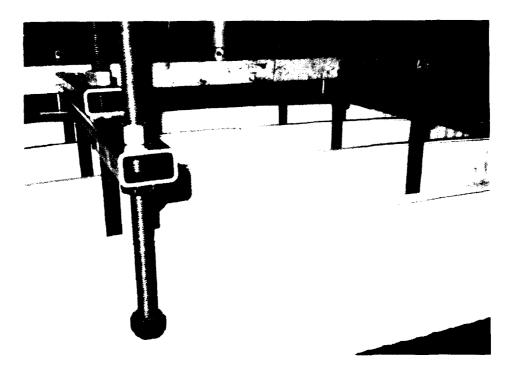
Failure of the four-panel simply supported beam tests, positive moment.
